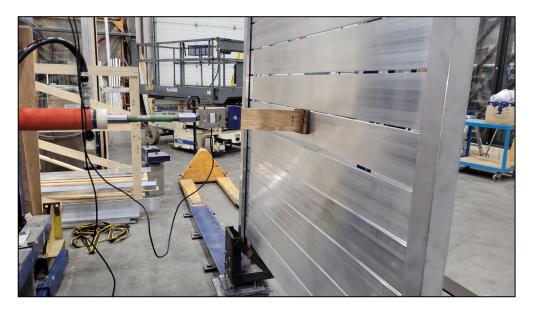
Privacy Wall (Fascia Mount) – In-fill Load Test
